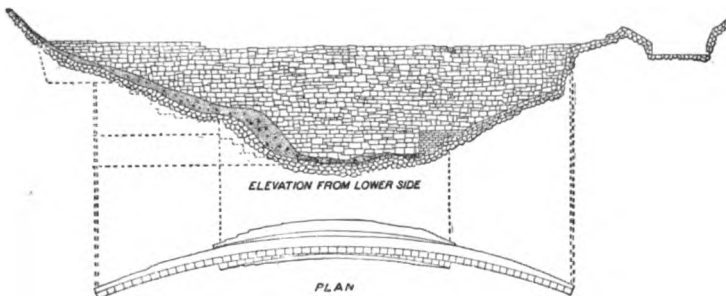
PLAN AND ELEVATION OF BEAR VALLEY DAM.
